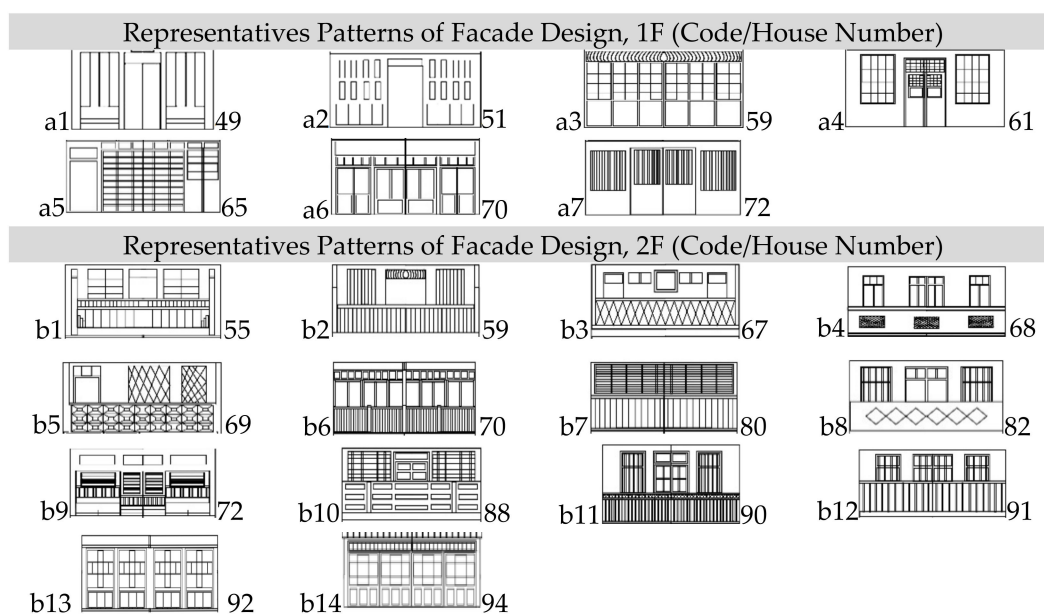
Main design styles of the building facade on Shennong Street. (Adapted from [18]).
